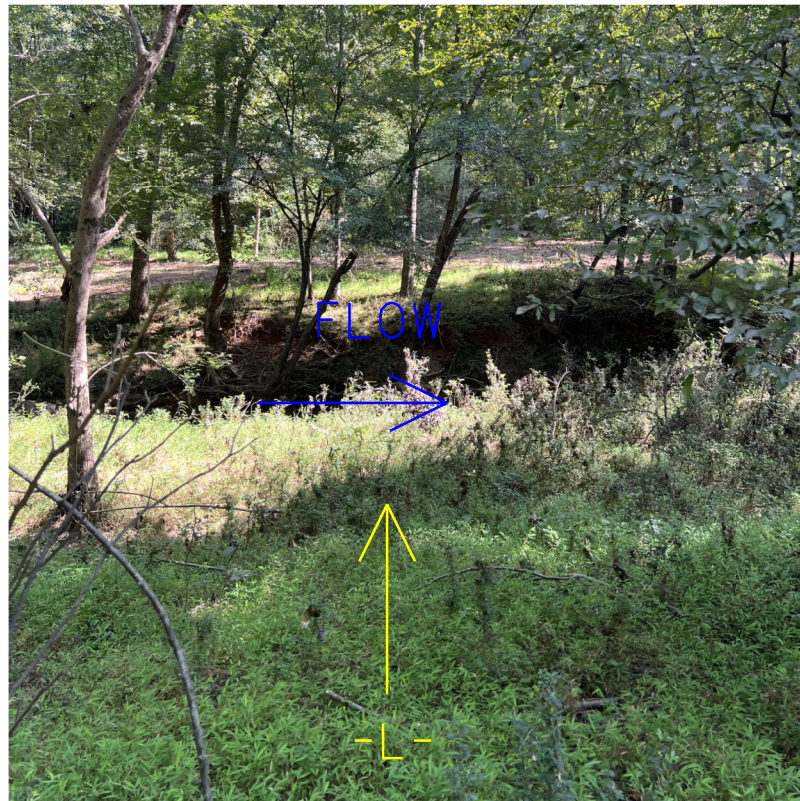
VIEW NEAR END BENT NO. 1, FACING UPSTATION
